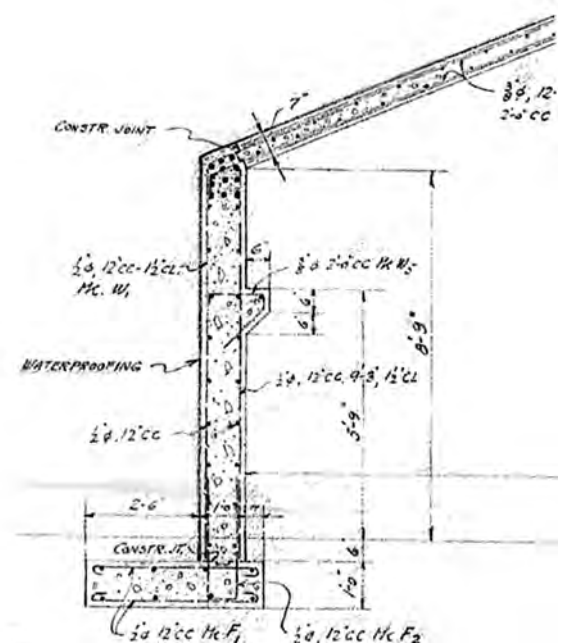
Detail from original construction drawings showing presumed main section through main concrete shell. See Appendix A for entire sheet. (OCMU Coll.)
